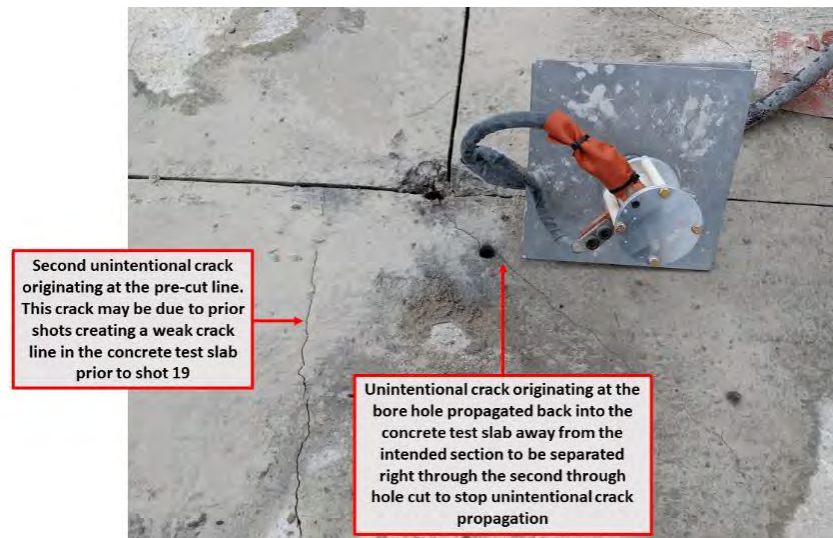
Shot 19: Two Unintentional Cracks Formed in the Concrete Test Section
